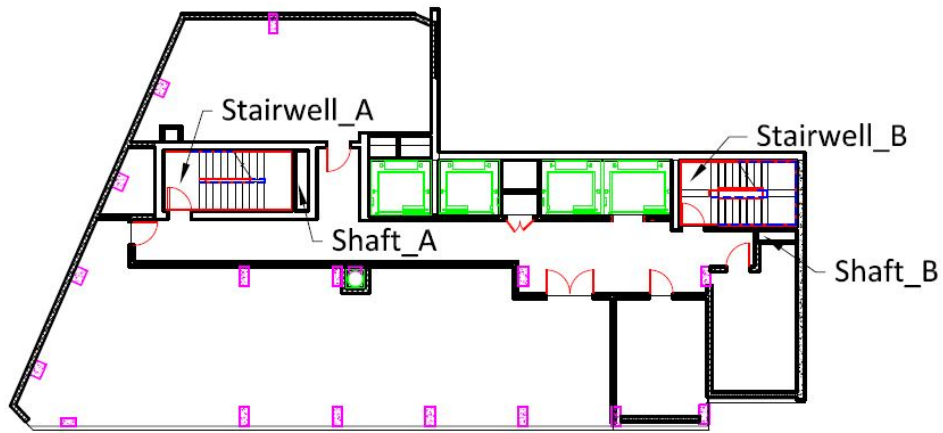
29th floor has an open layout for mechanical equipment.
